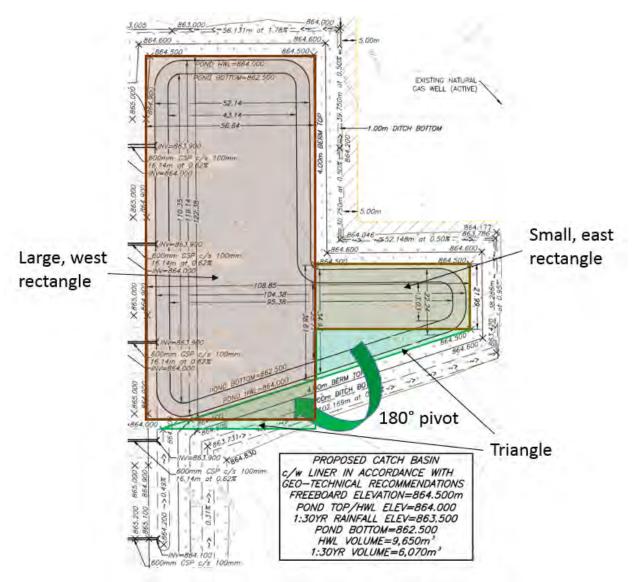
Irregular shape catch basin. Al-Terra Engineering (Red Deer) Ltd., Site Grading Plan Sheet C02. #5, 2022-02-23. Color shading and labels added.
